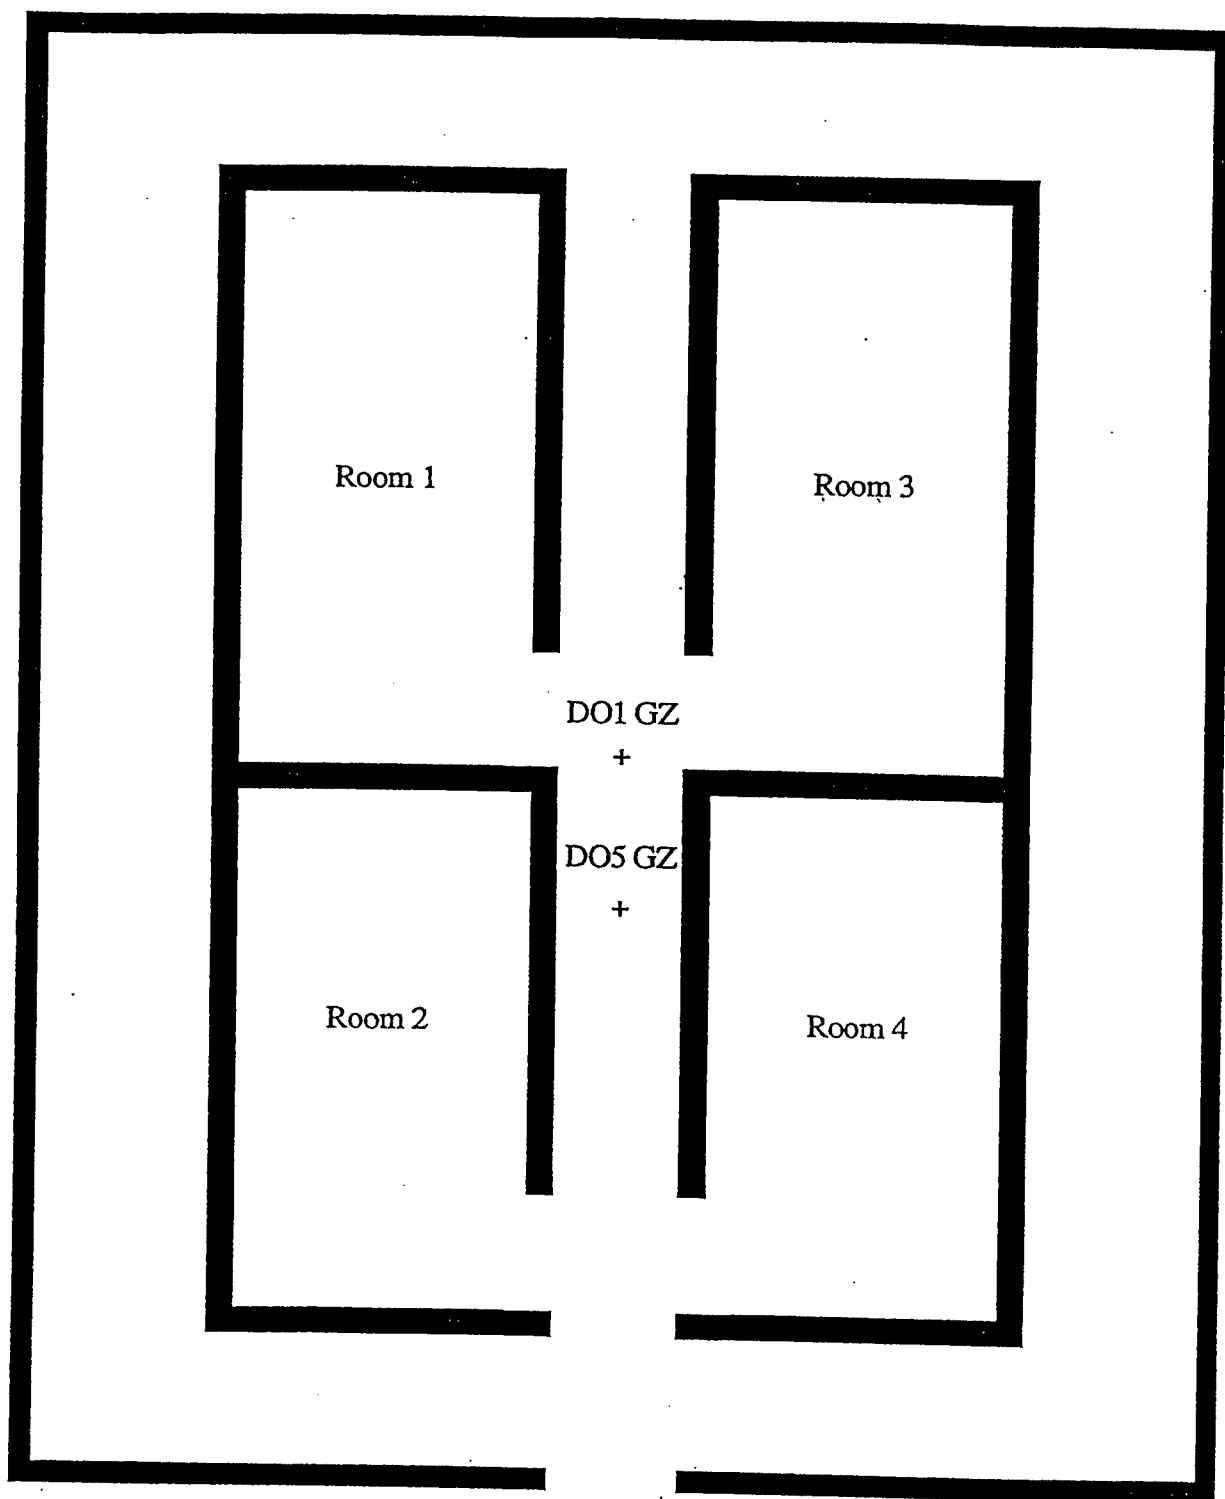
Floor plan for DIPOLE ORBIT 1 and 5 structures.
